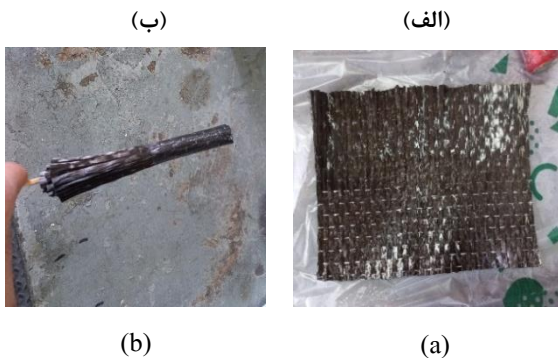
Steps of anchor construction: (a) cutting CFRP to required lengths; (b) rolling the anchor around the dowel
